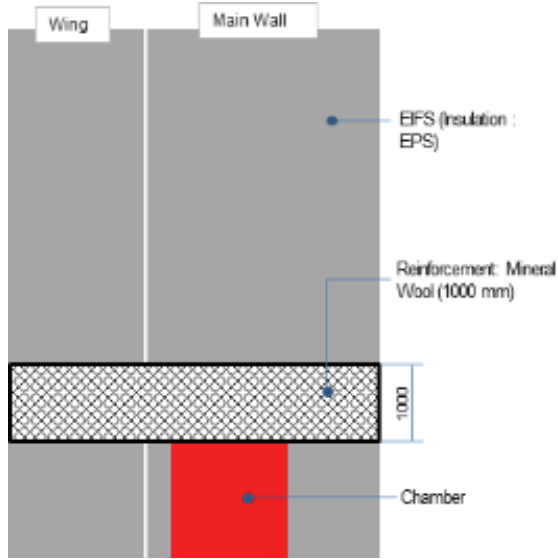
Elevation of EIFS 2 (Reinforcement: Mineral Wool 1,000 mm)
